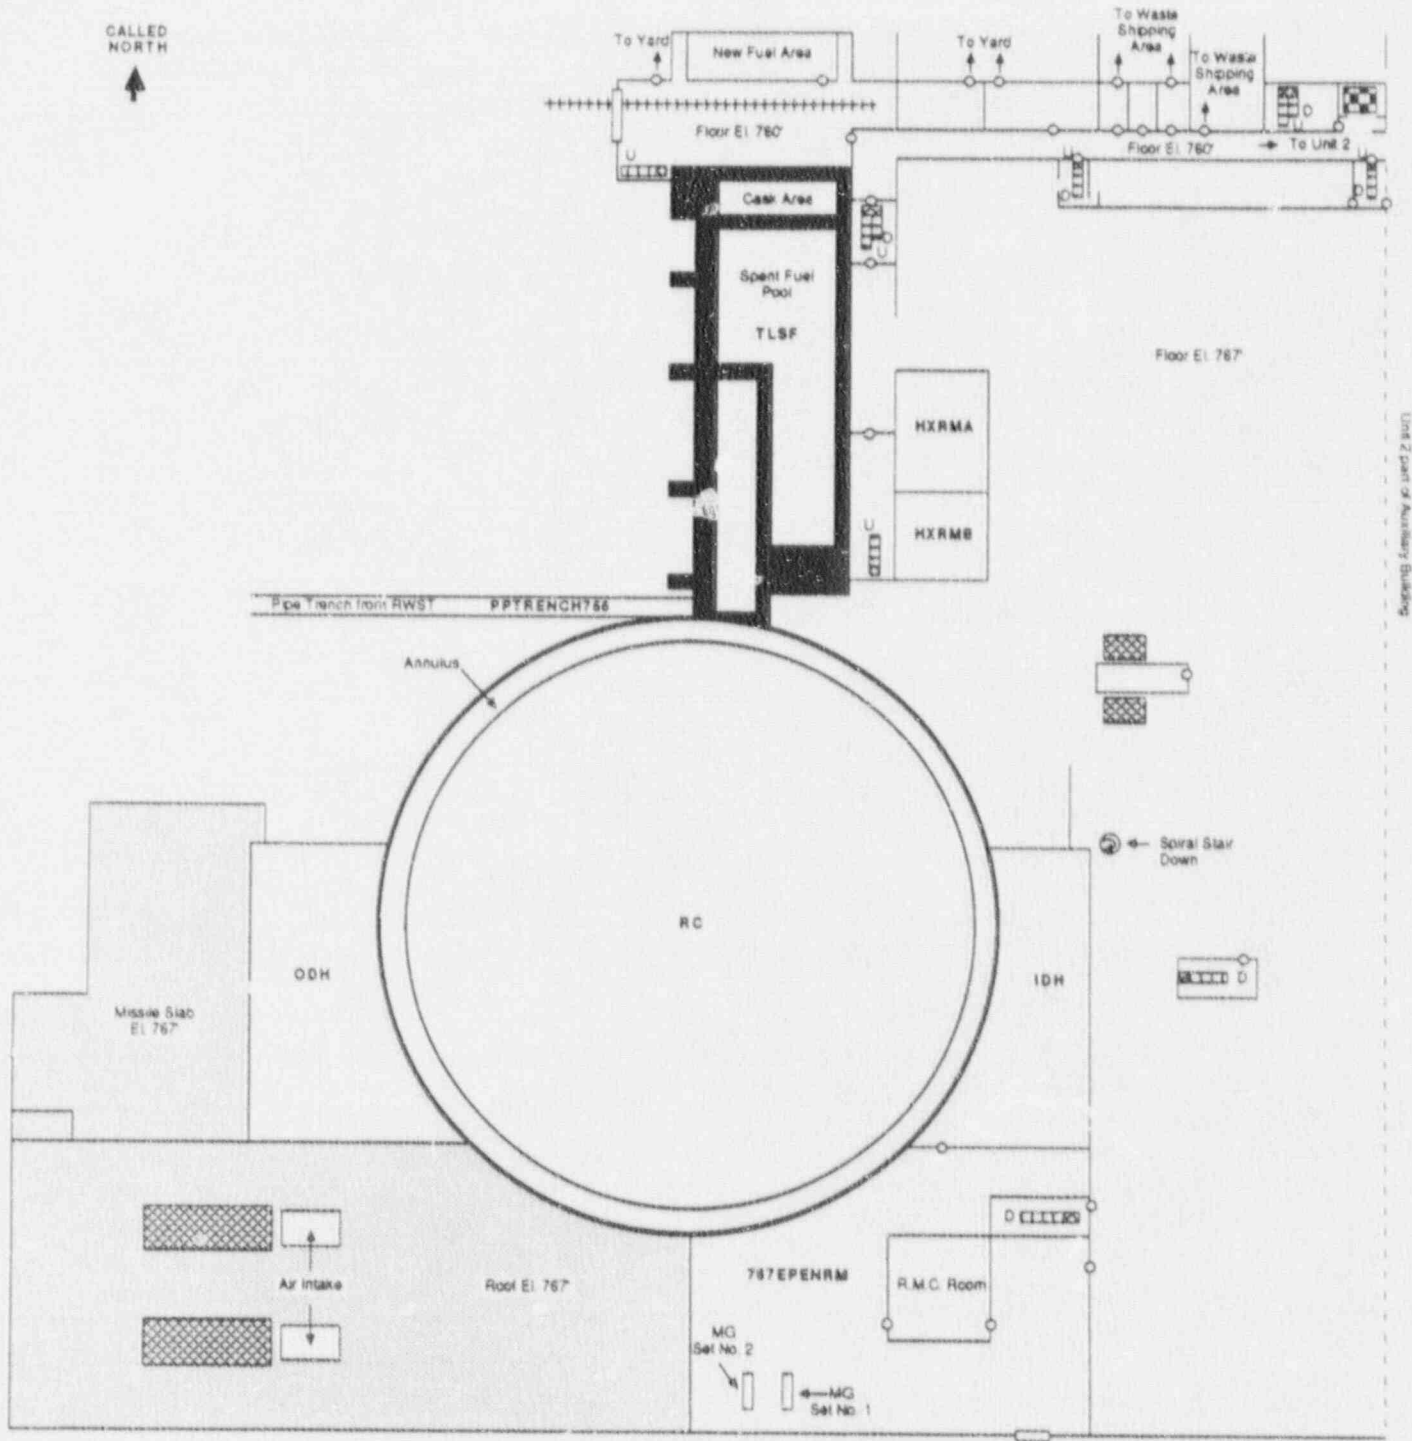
McGuire Unit 1 Reactor and Auxiliary Buildings, Elevation 760' and 767'
